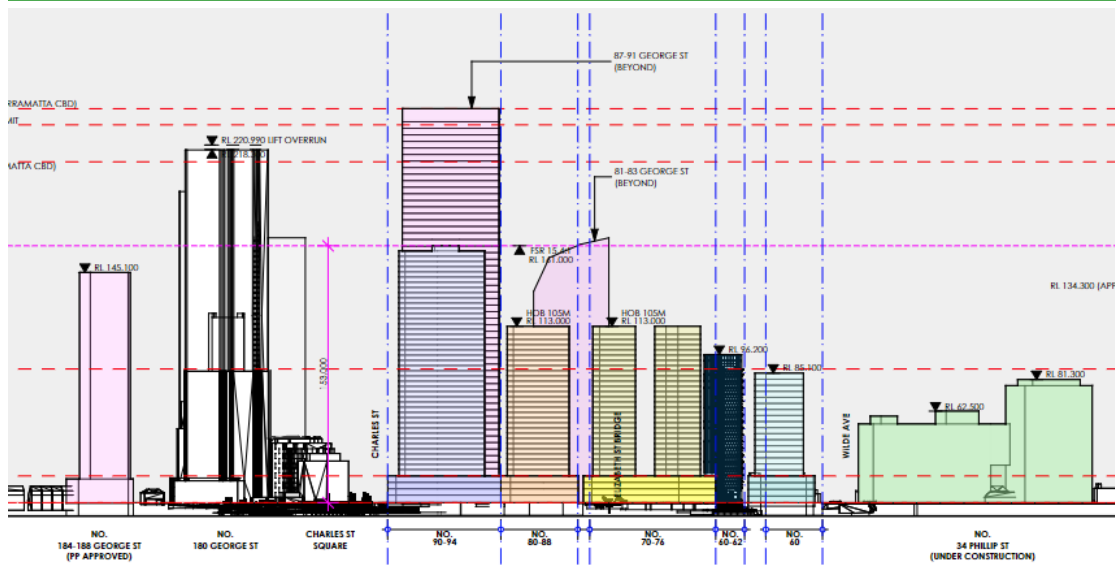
Existing, proposed, and perceived building form, river front elevation (PTI Architecture)
